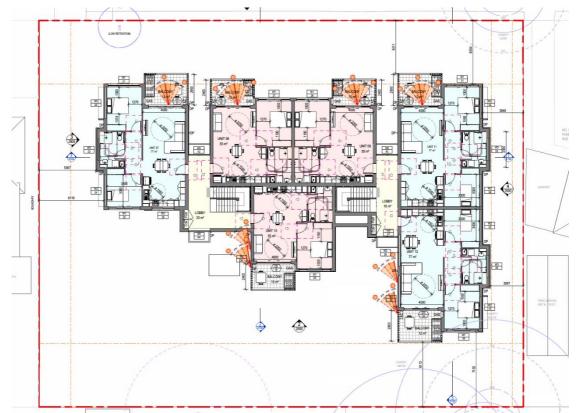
Extract from Architectural Plans – General Arrangement Plan – First Level (Source: Architectural Plans, Mode Design, dated 13.06.2023)
